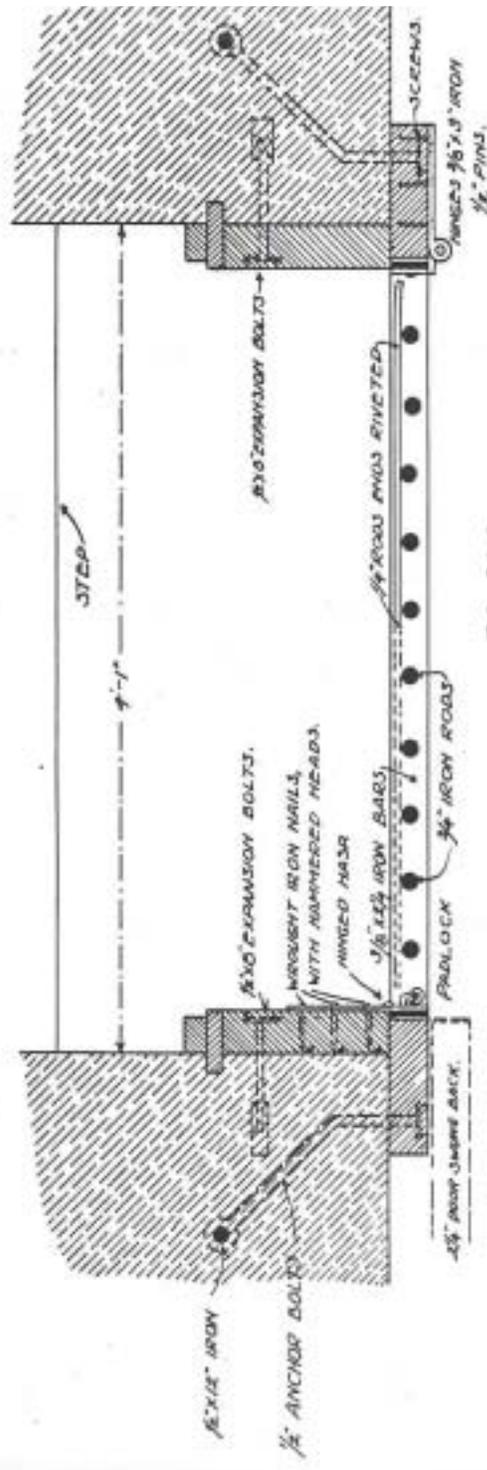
Section of exterior doorway opening and plan of jamb, as designed on original 1894 drawings.
